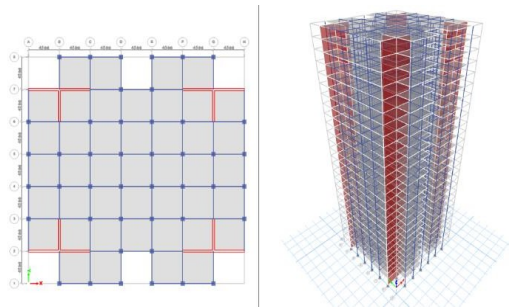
Plan of Structure T- Shape shear Wall (Model3)
